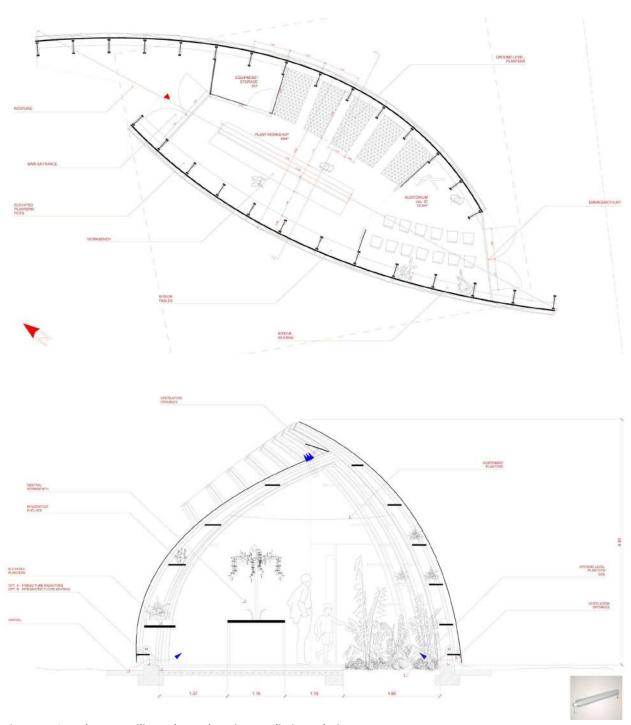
Greenhouse pavilion - plan and section - preliminary design.
